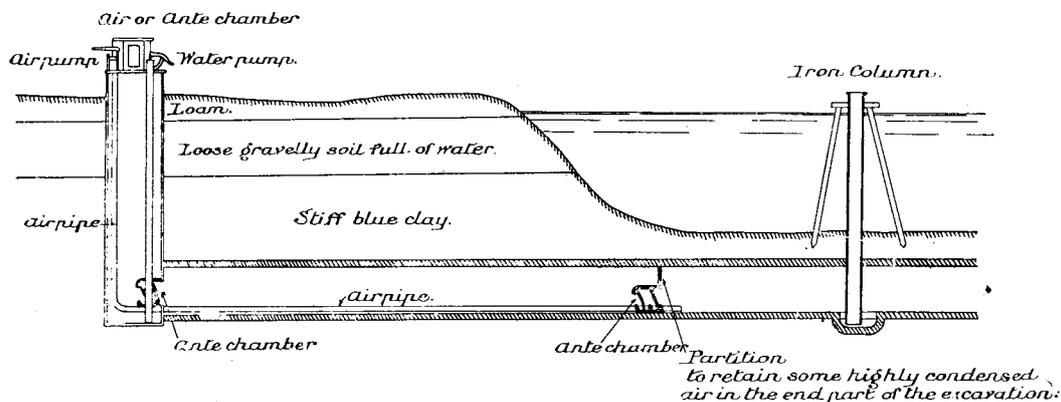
COCHRANE'S SYSTEM OF TUNNELLING BY COMPRESSED AIR.
